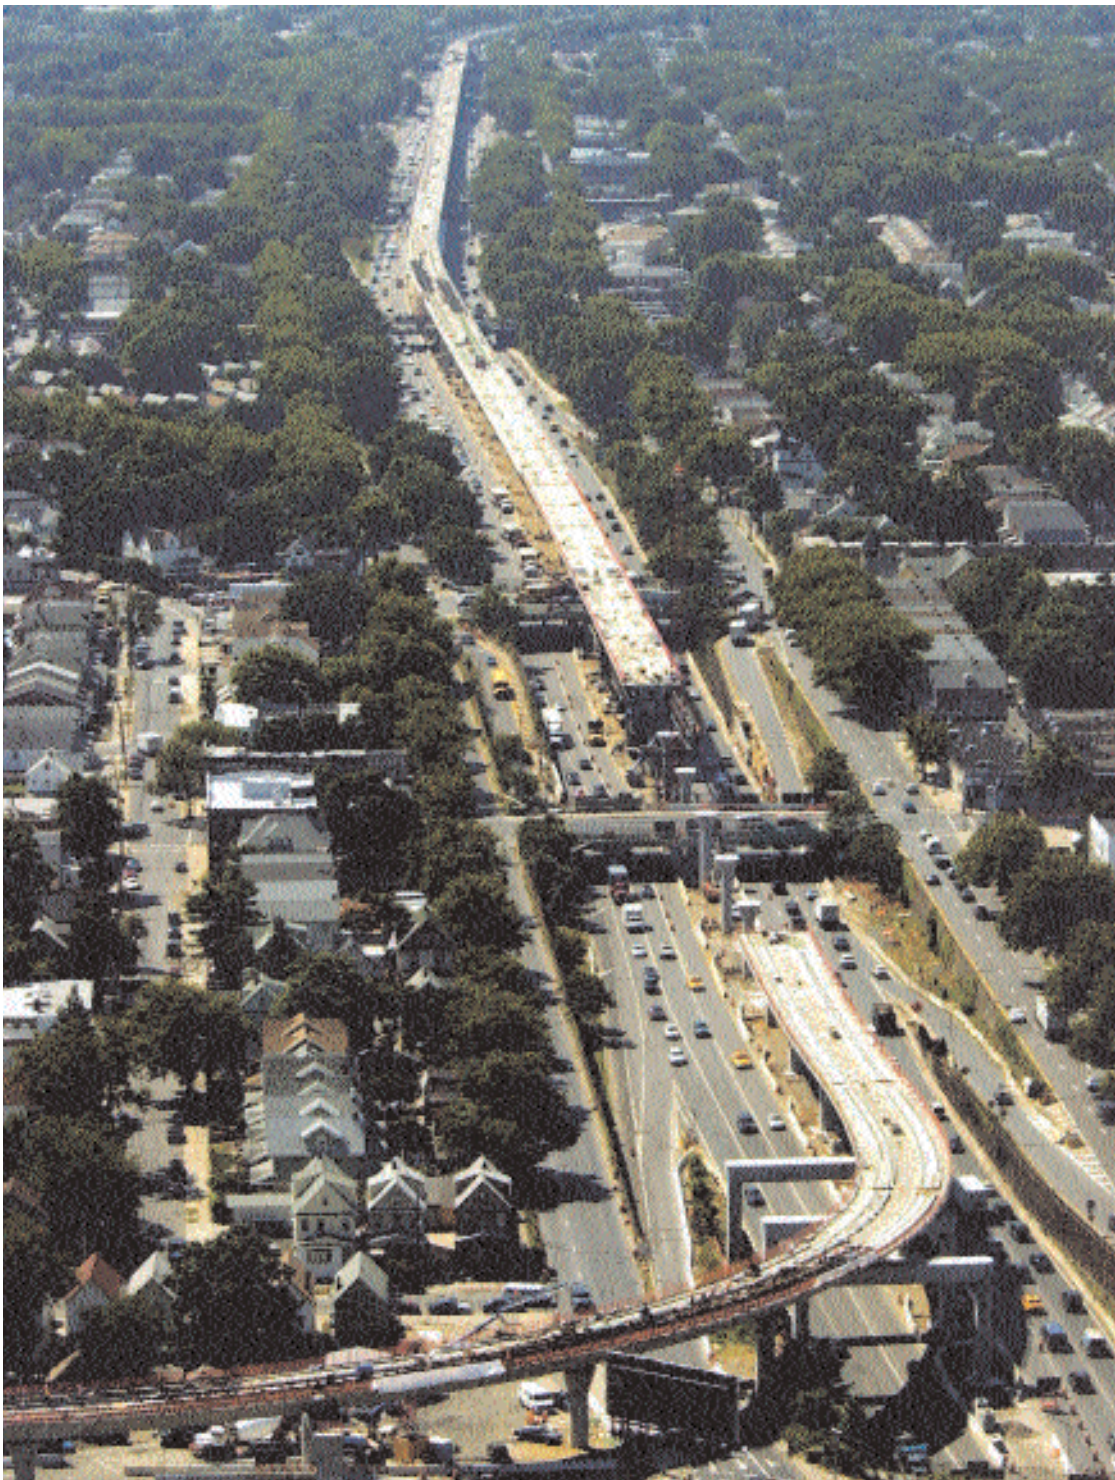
The superstructure erection system had to be flexible enough to accommodate placing segments within inches (25 to 50 mm) of existing buildings, over major highways and service roads and around utility locations. Photo courtesy: Figg Engineering Group.
